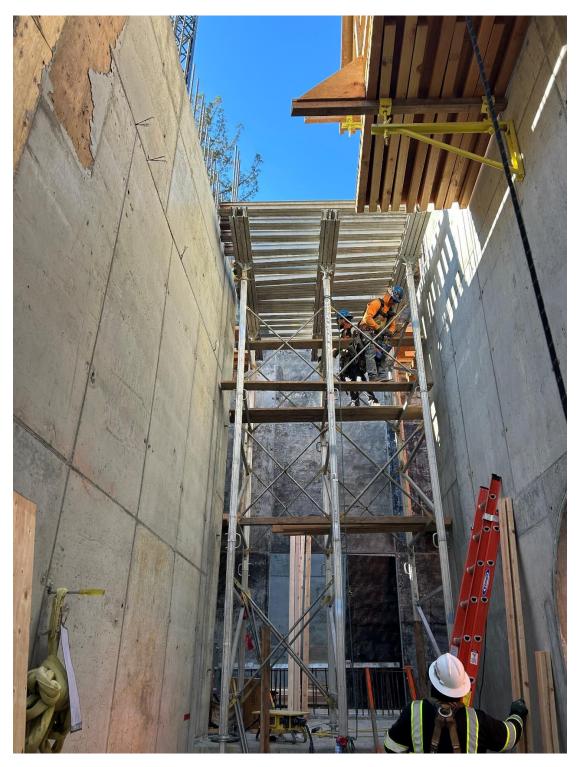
Installation of the scaffolding towers for the CCB roof. These towers support the concrete formwork as concrete is placed and cured.
